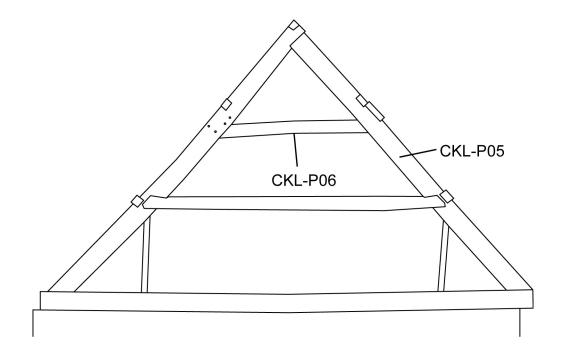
Truss 4 looking south, showing the location of samples CKL-P05 and CKL-P06 (after lan Wells)
